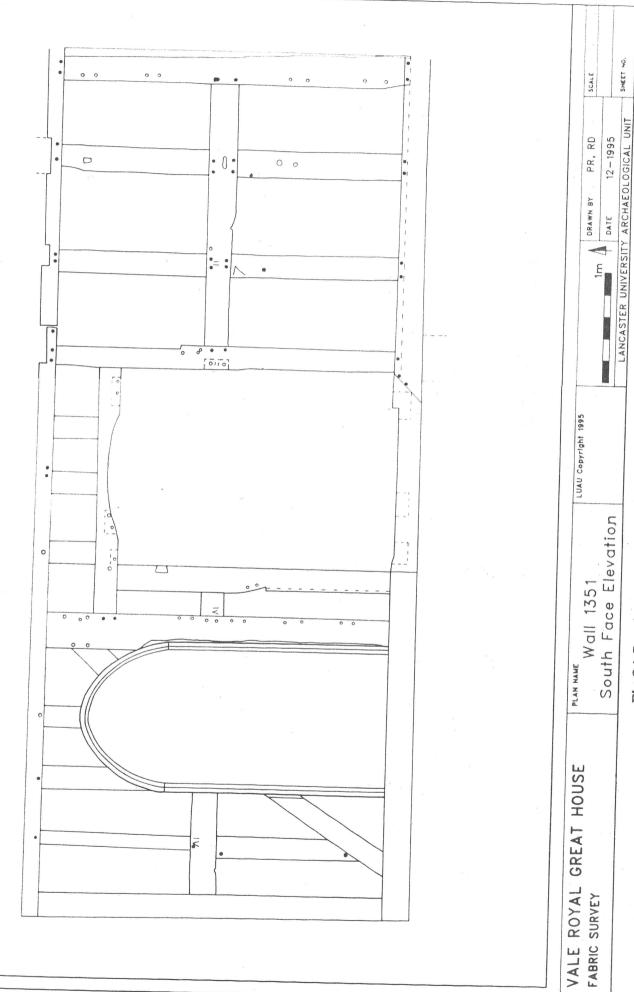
South Face Elevation Wall 1351 - South Range, First Floor
